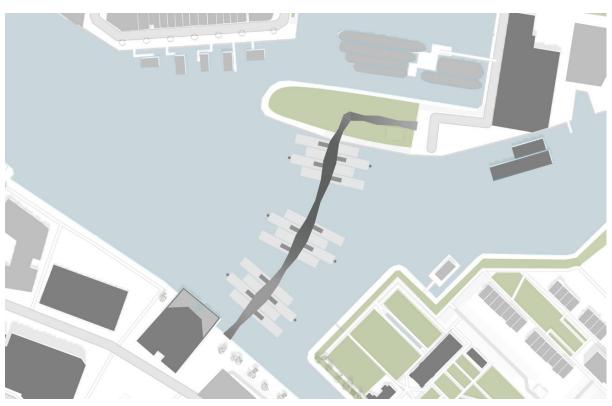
The connection concept in the master plan of Stadswerven (Source: Author, 2025).
